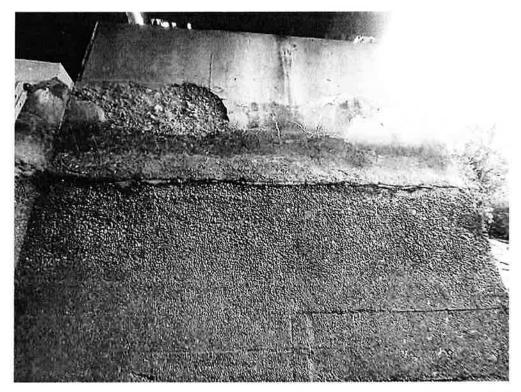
Southeast pier, west face - spall with exposed rebar with an adjacent delamination.
